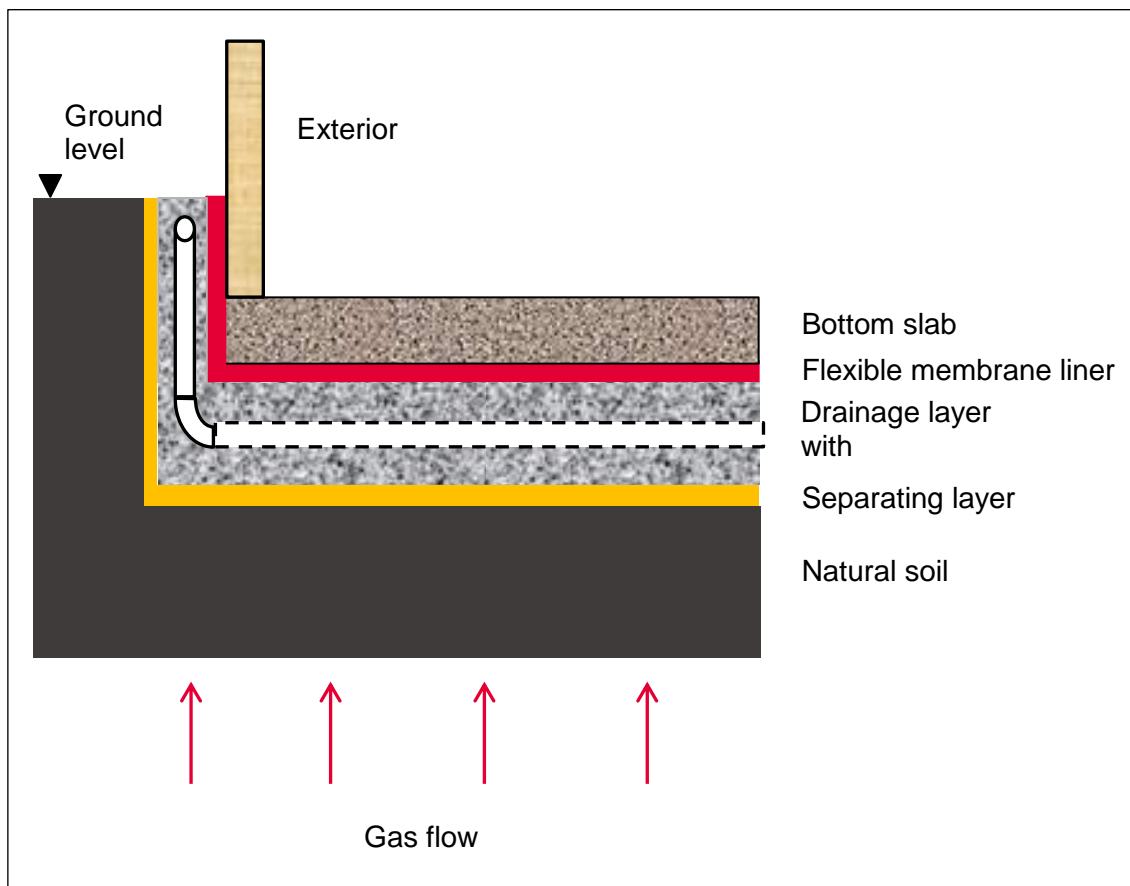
Gravel-bed drainage with embedded drainage pipes
